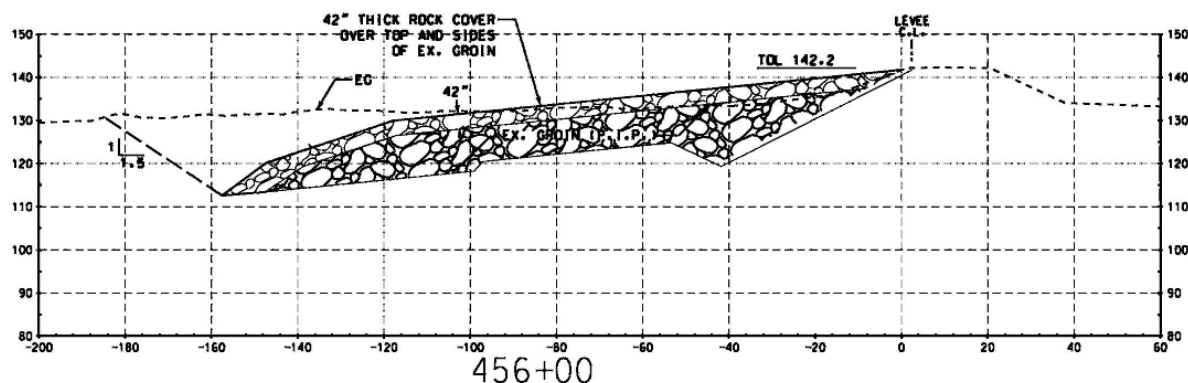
Typical Cross Section of Measure 12, Failure Reach 3
